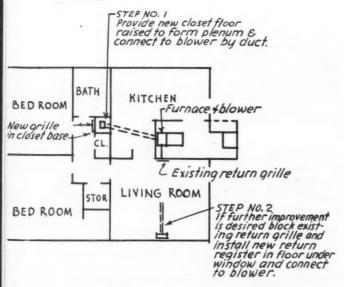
Single return systems may need a new return in the hall (old return also used) or old return may be closed and a second new return placed near an outside wall and connected to blower.
